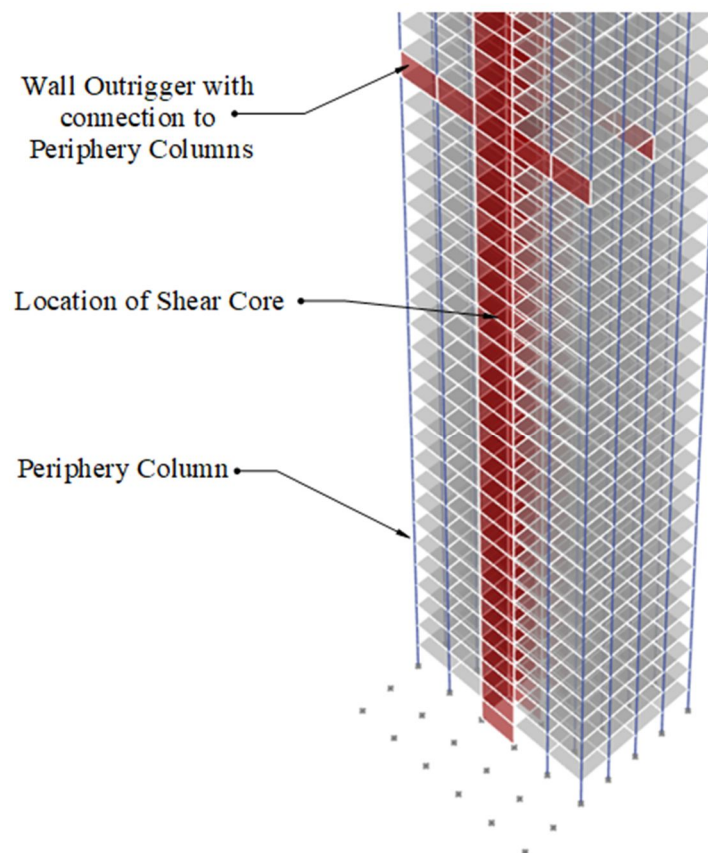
With wall outrigger - 3D cutout view of the tall structure
